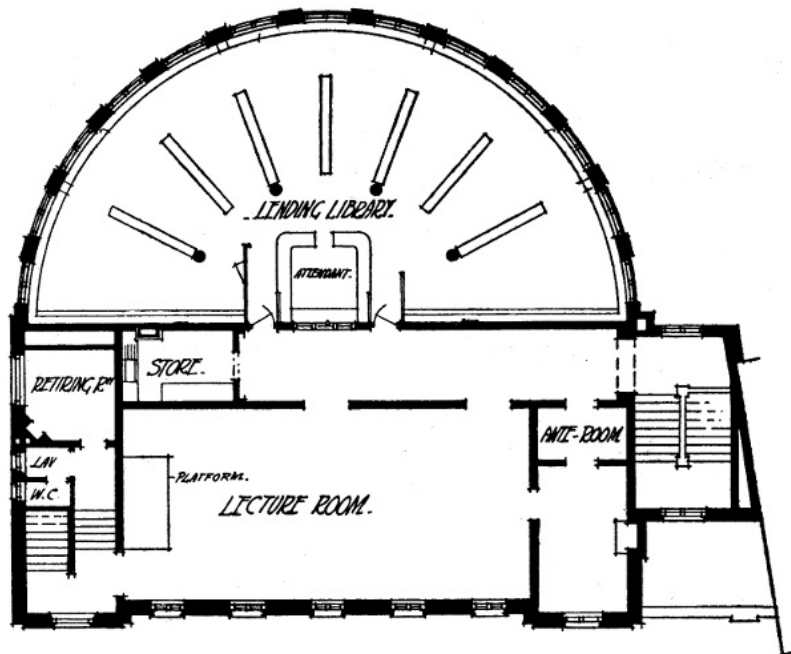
North Islington Library, with Lending Department on First Floor (Section 120).
